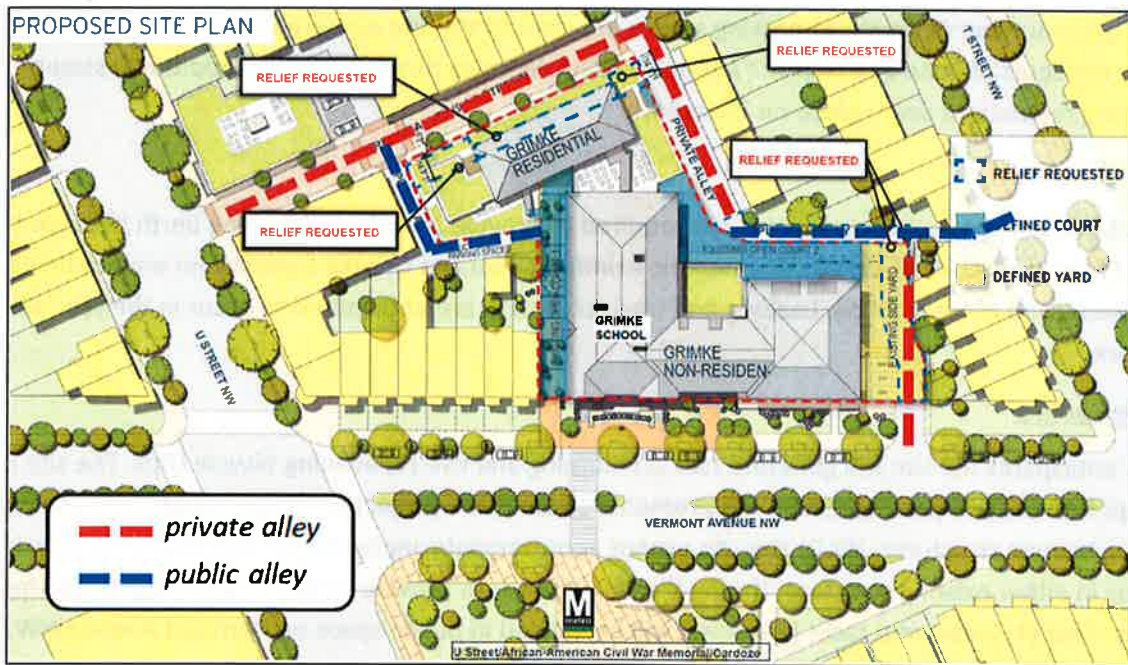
Site Plan: (Source: Applicant's Architectural Plans, Exhibit 7A, dated 5/9/18)
